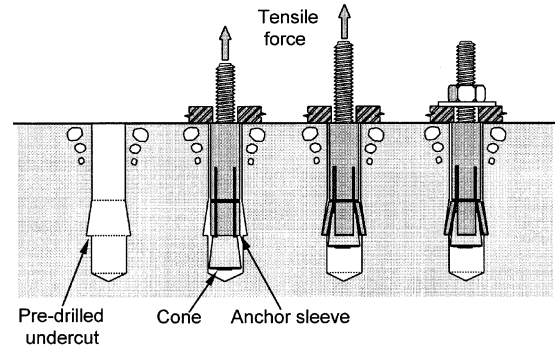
(a)—Type 1 undercut anchor. Load-controlled anchor installed by tensioning anchor causing sleeve to expand into predrilled undercut.
